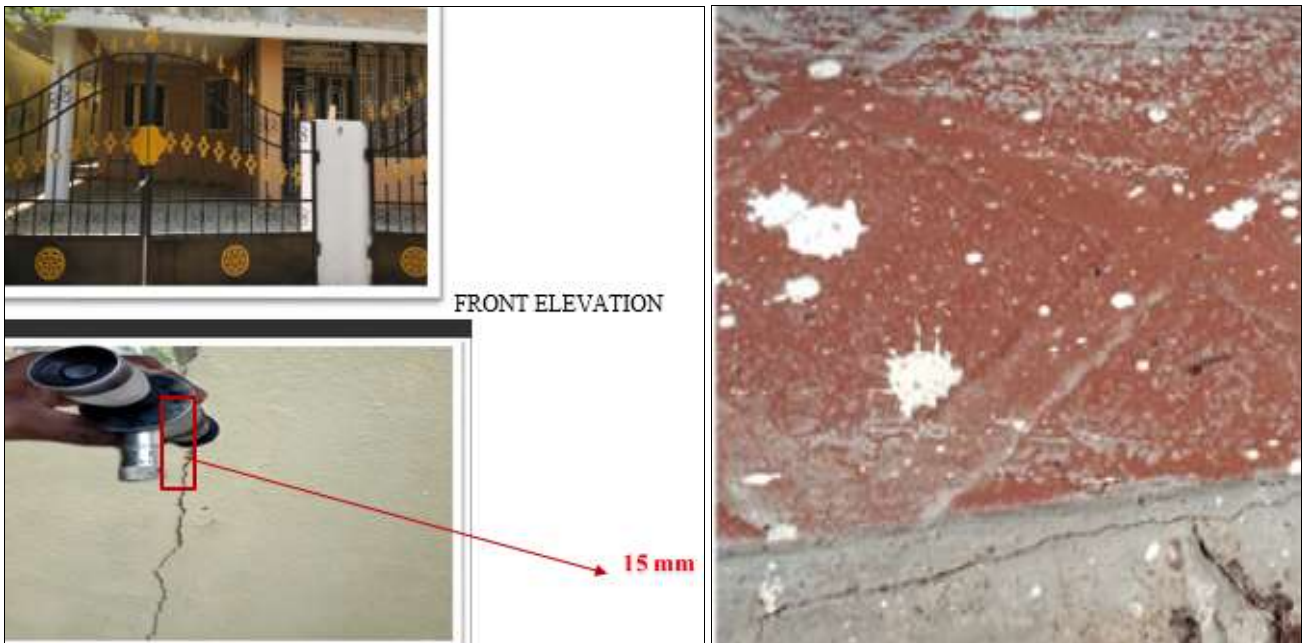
location 2, settlement of 20 mm was observed near the Main Gate of the residence and cracks in the wall
